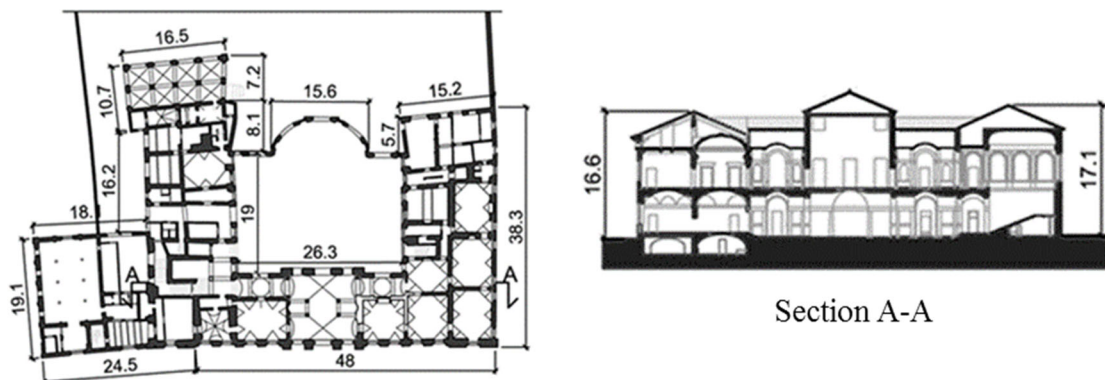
Palazzo d'Arco: plan, section and indication of the main geometrical dimensions.
